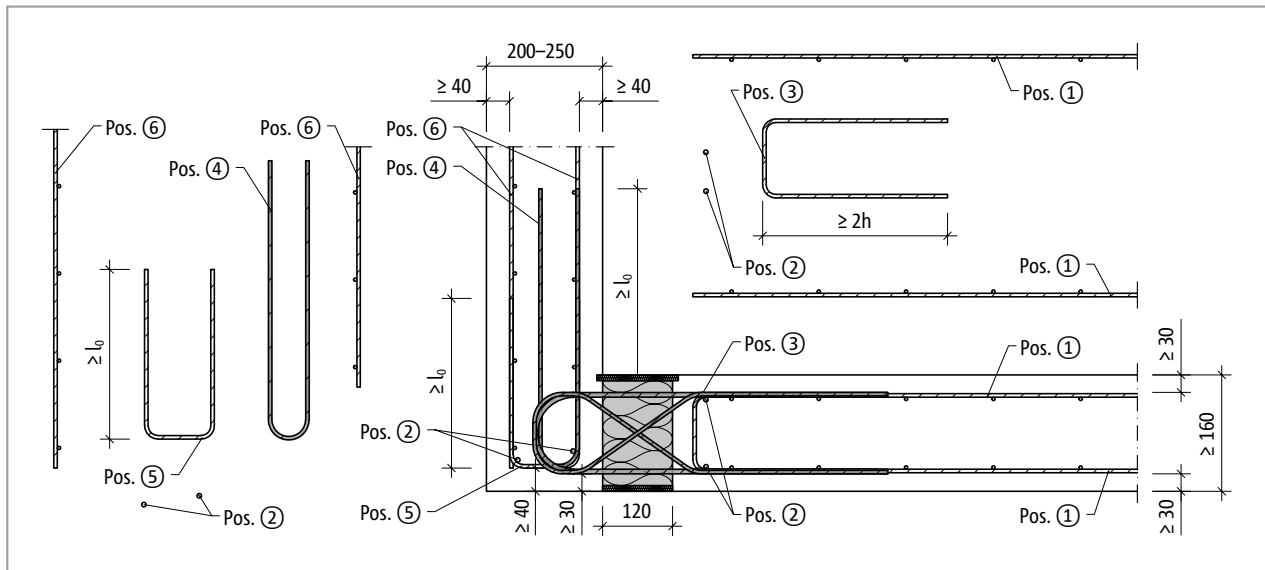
Schöck Isokorb® XT type F: On-site reinforcement with parapet/balustrade width  $b = 200 - 250$ ; on-site reinforcement  $b = 160 - 190$  such as  $b = 200 - 250$  without Pos. 5
